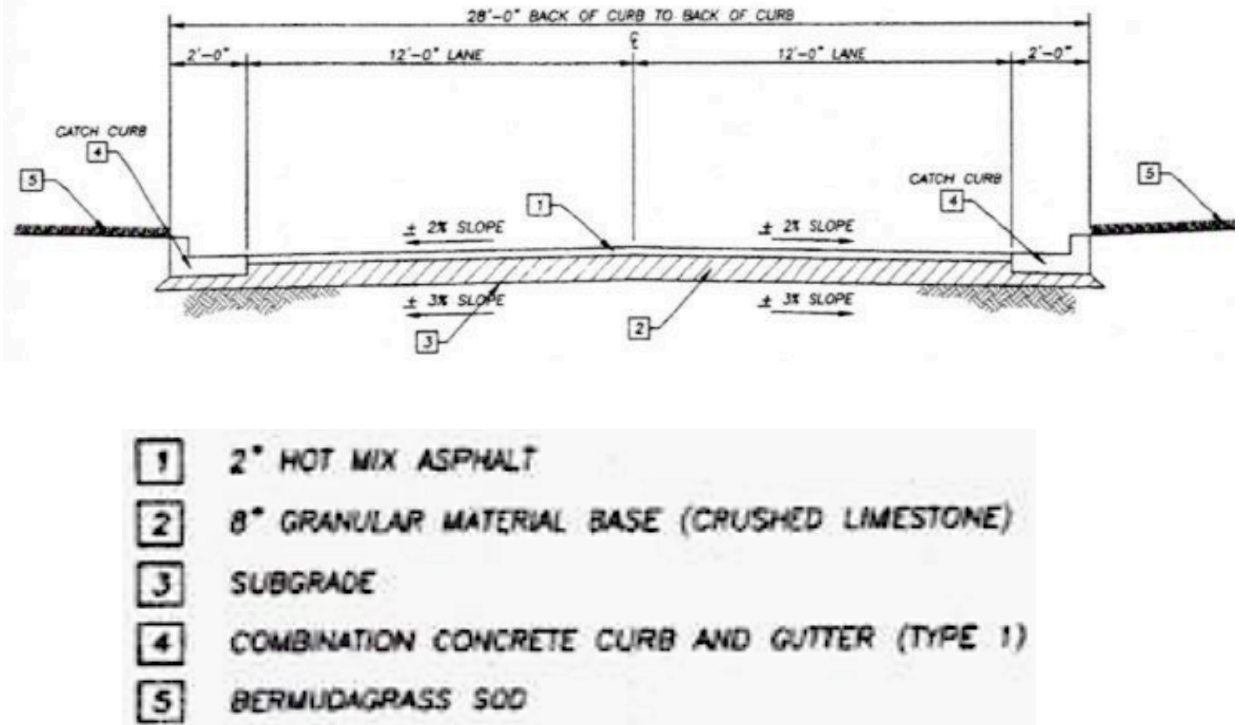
Cross Section of Asphalt Pavement (Lehman-Roberts)
